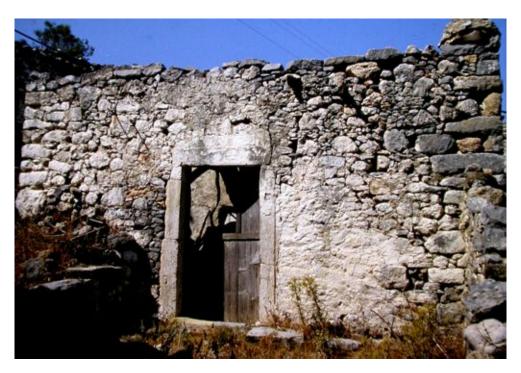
Façade of a traditional house (abandoned) in Kavousi, Crete
